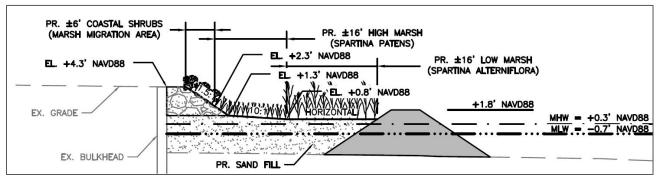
Proposed Stone Toe Protection for Existing Peninsula
